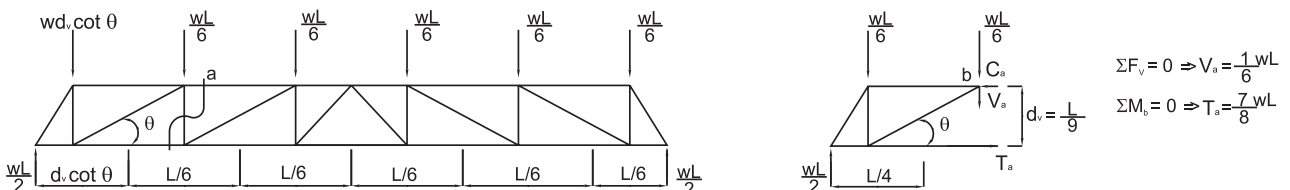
Reinforced or prestressed concrete beam idealized as a varying angle hybrid truss.
